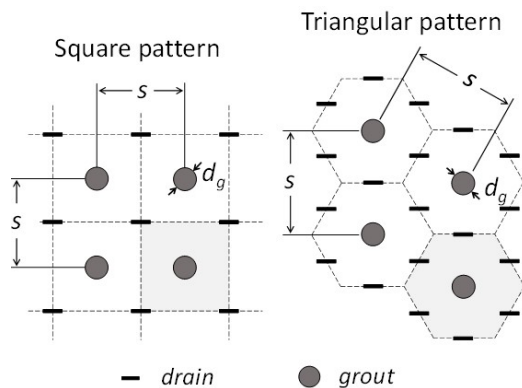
Typical *CPR* grouting layout plans. The area of the unit cell is shaded.
